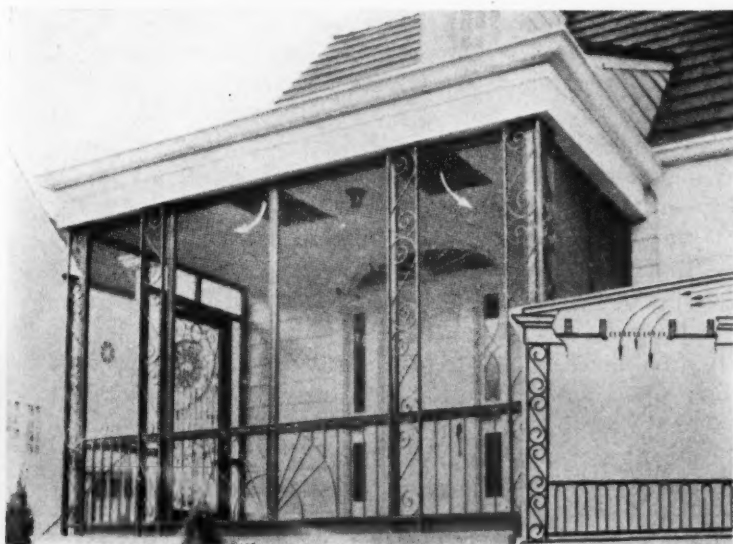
Sheltered, inside porch ceiling exhaust openings with either wood or metal grille. (New Orleans Public Service Corp. photo).
